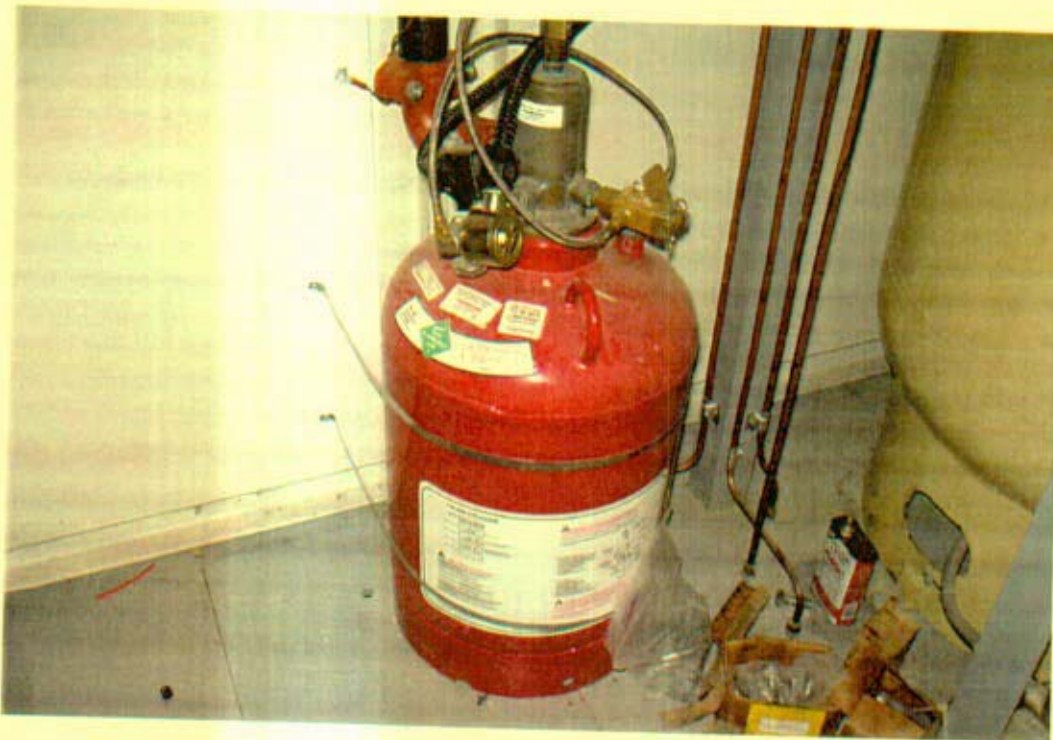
Mechanical Package FM-200 Bottle.
